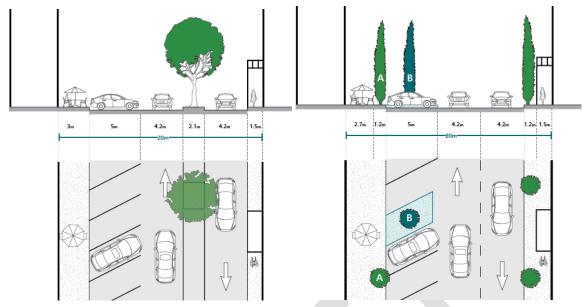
Indicative centreline and boulevard style tree planting and car parking options
